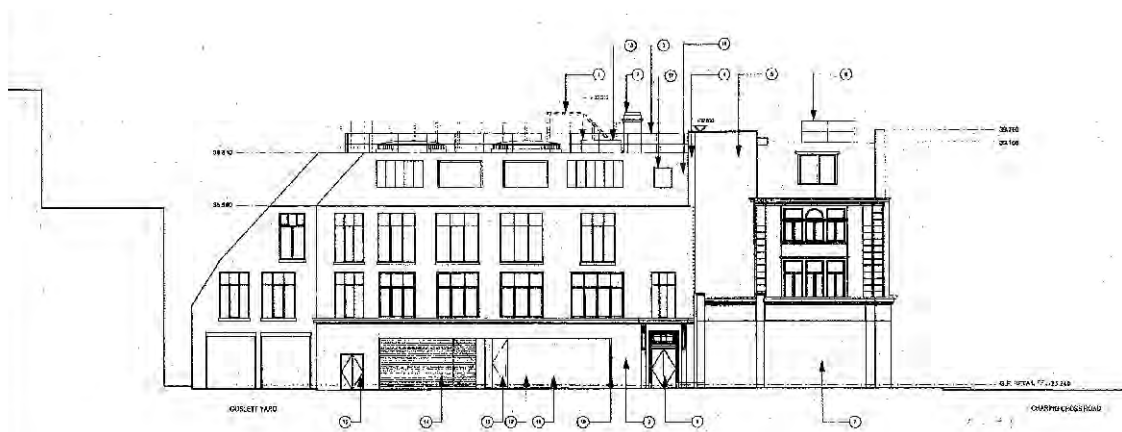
South elevation of Building 3 c 2003, onto Goslett Yard, showing the proposed link
